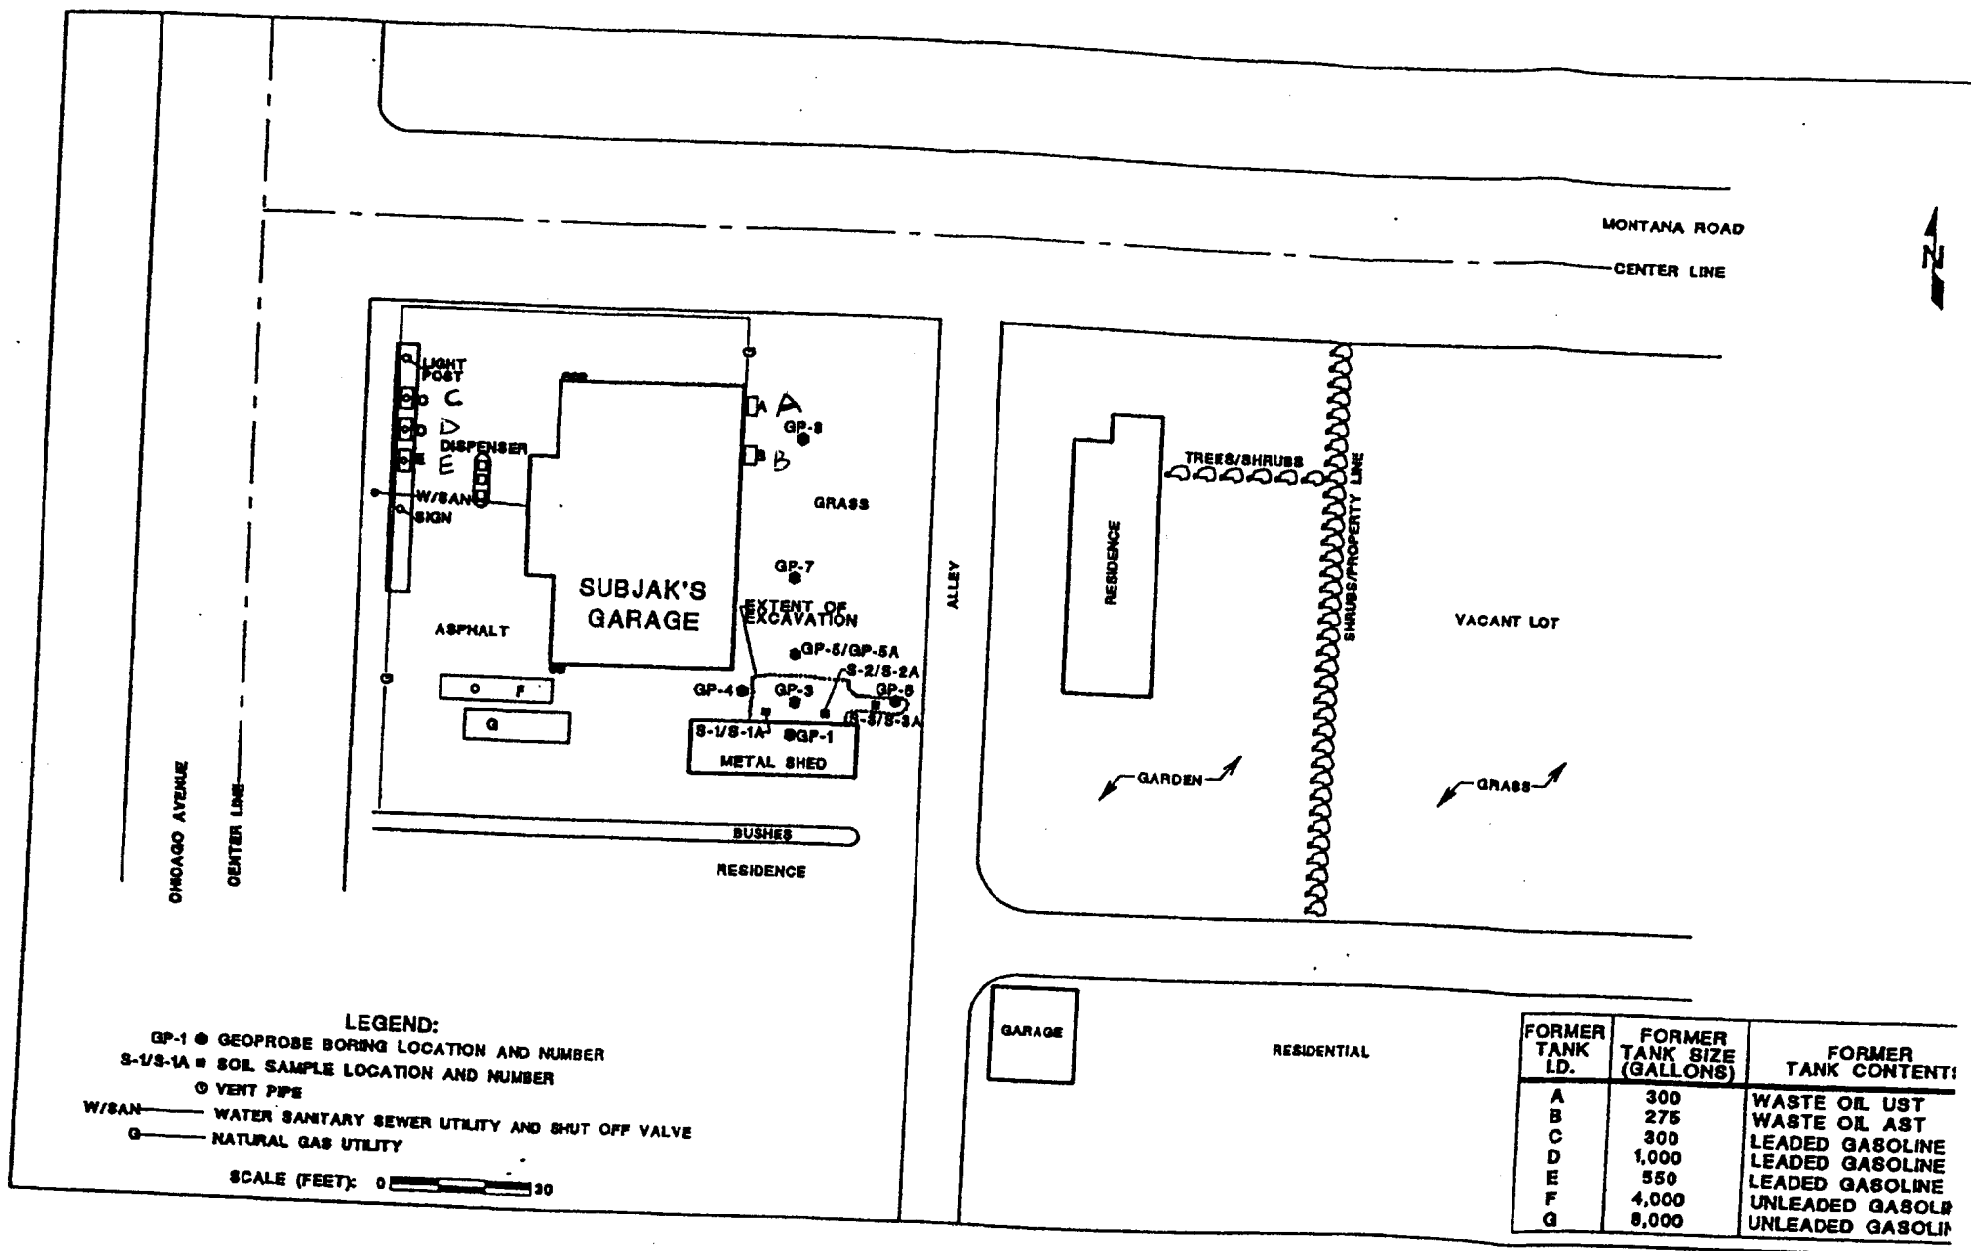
SITE FEATURES, BORING, AND SOIL SAMPLE LOCATIONS
